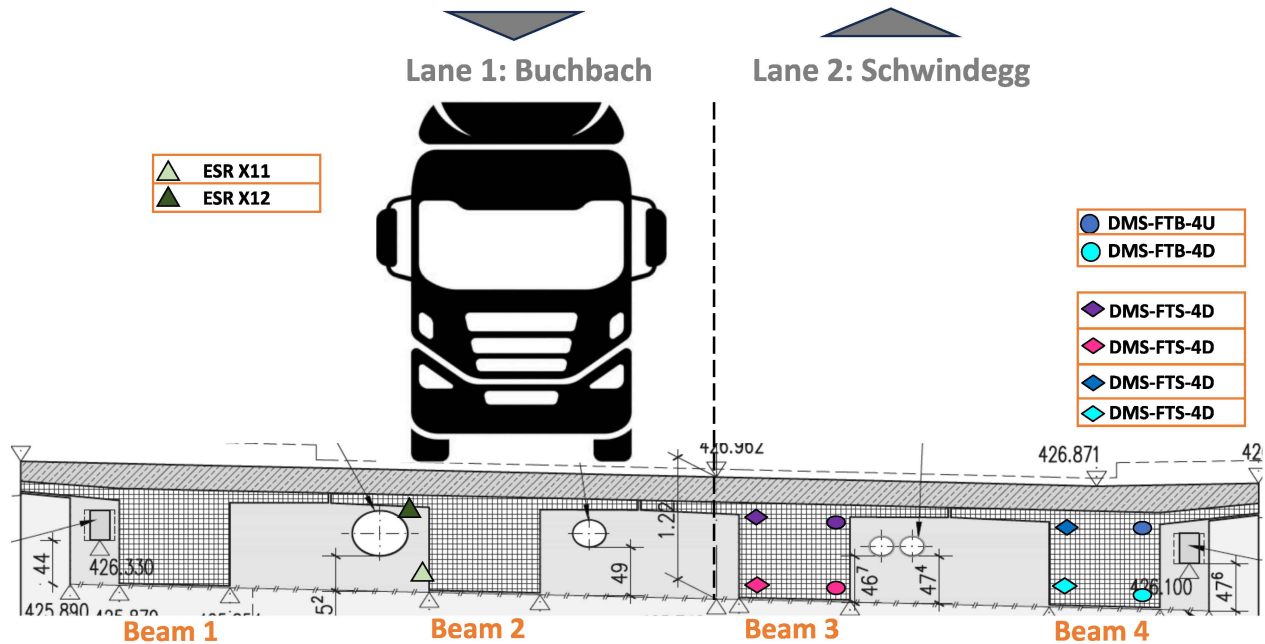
Cross section in mid span of the Isen bridge Schwindegg, showing the truck centered above Beam 2 and the arrangement of strain gauges (DMS) and Heidenhain ESR Sensors across the four girders
